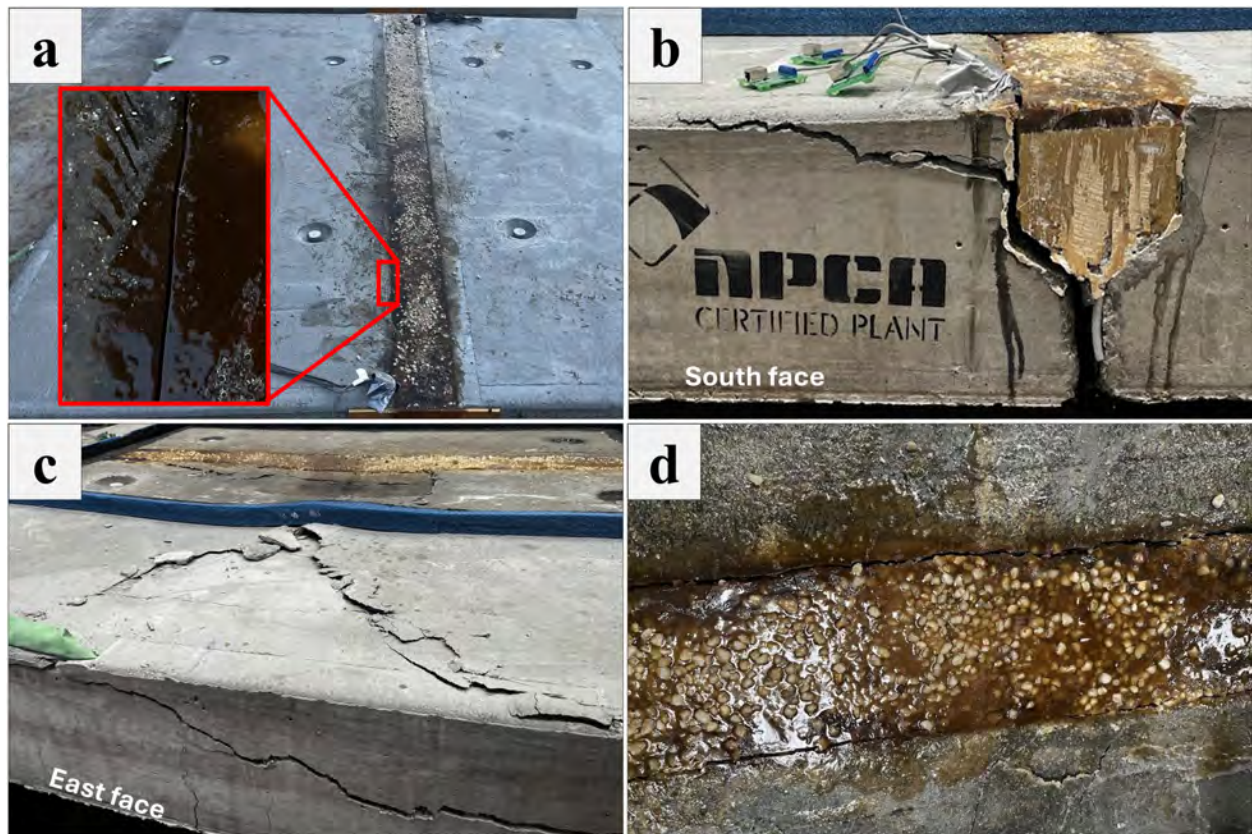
a) Crack formed in the PPC material before test b) Shear cracks formed in the south face c) Shear and diagonal cracks in the loaded slab d) Debonding of PPC from the precast slab
